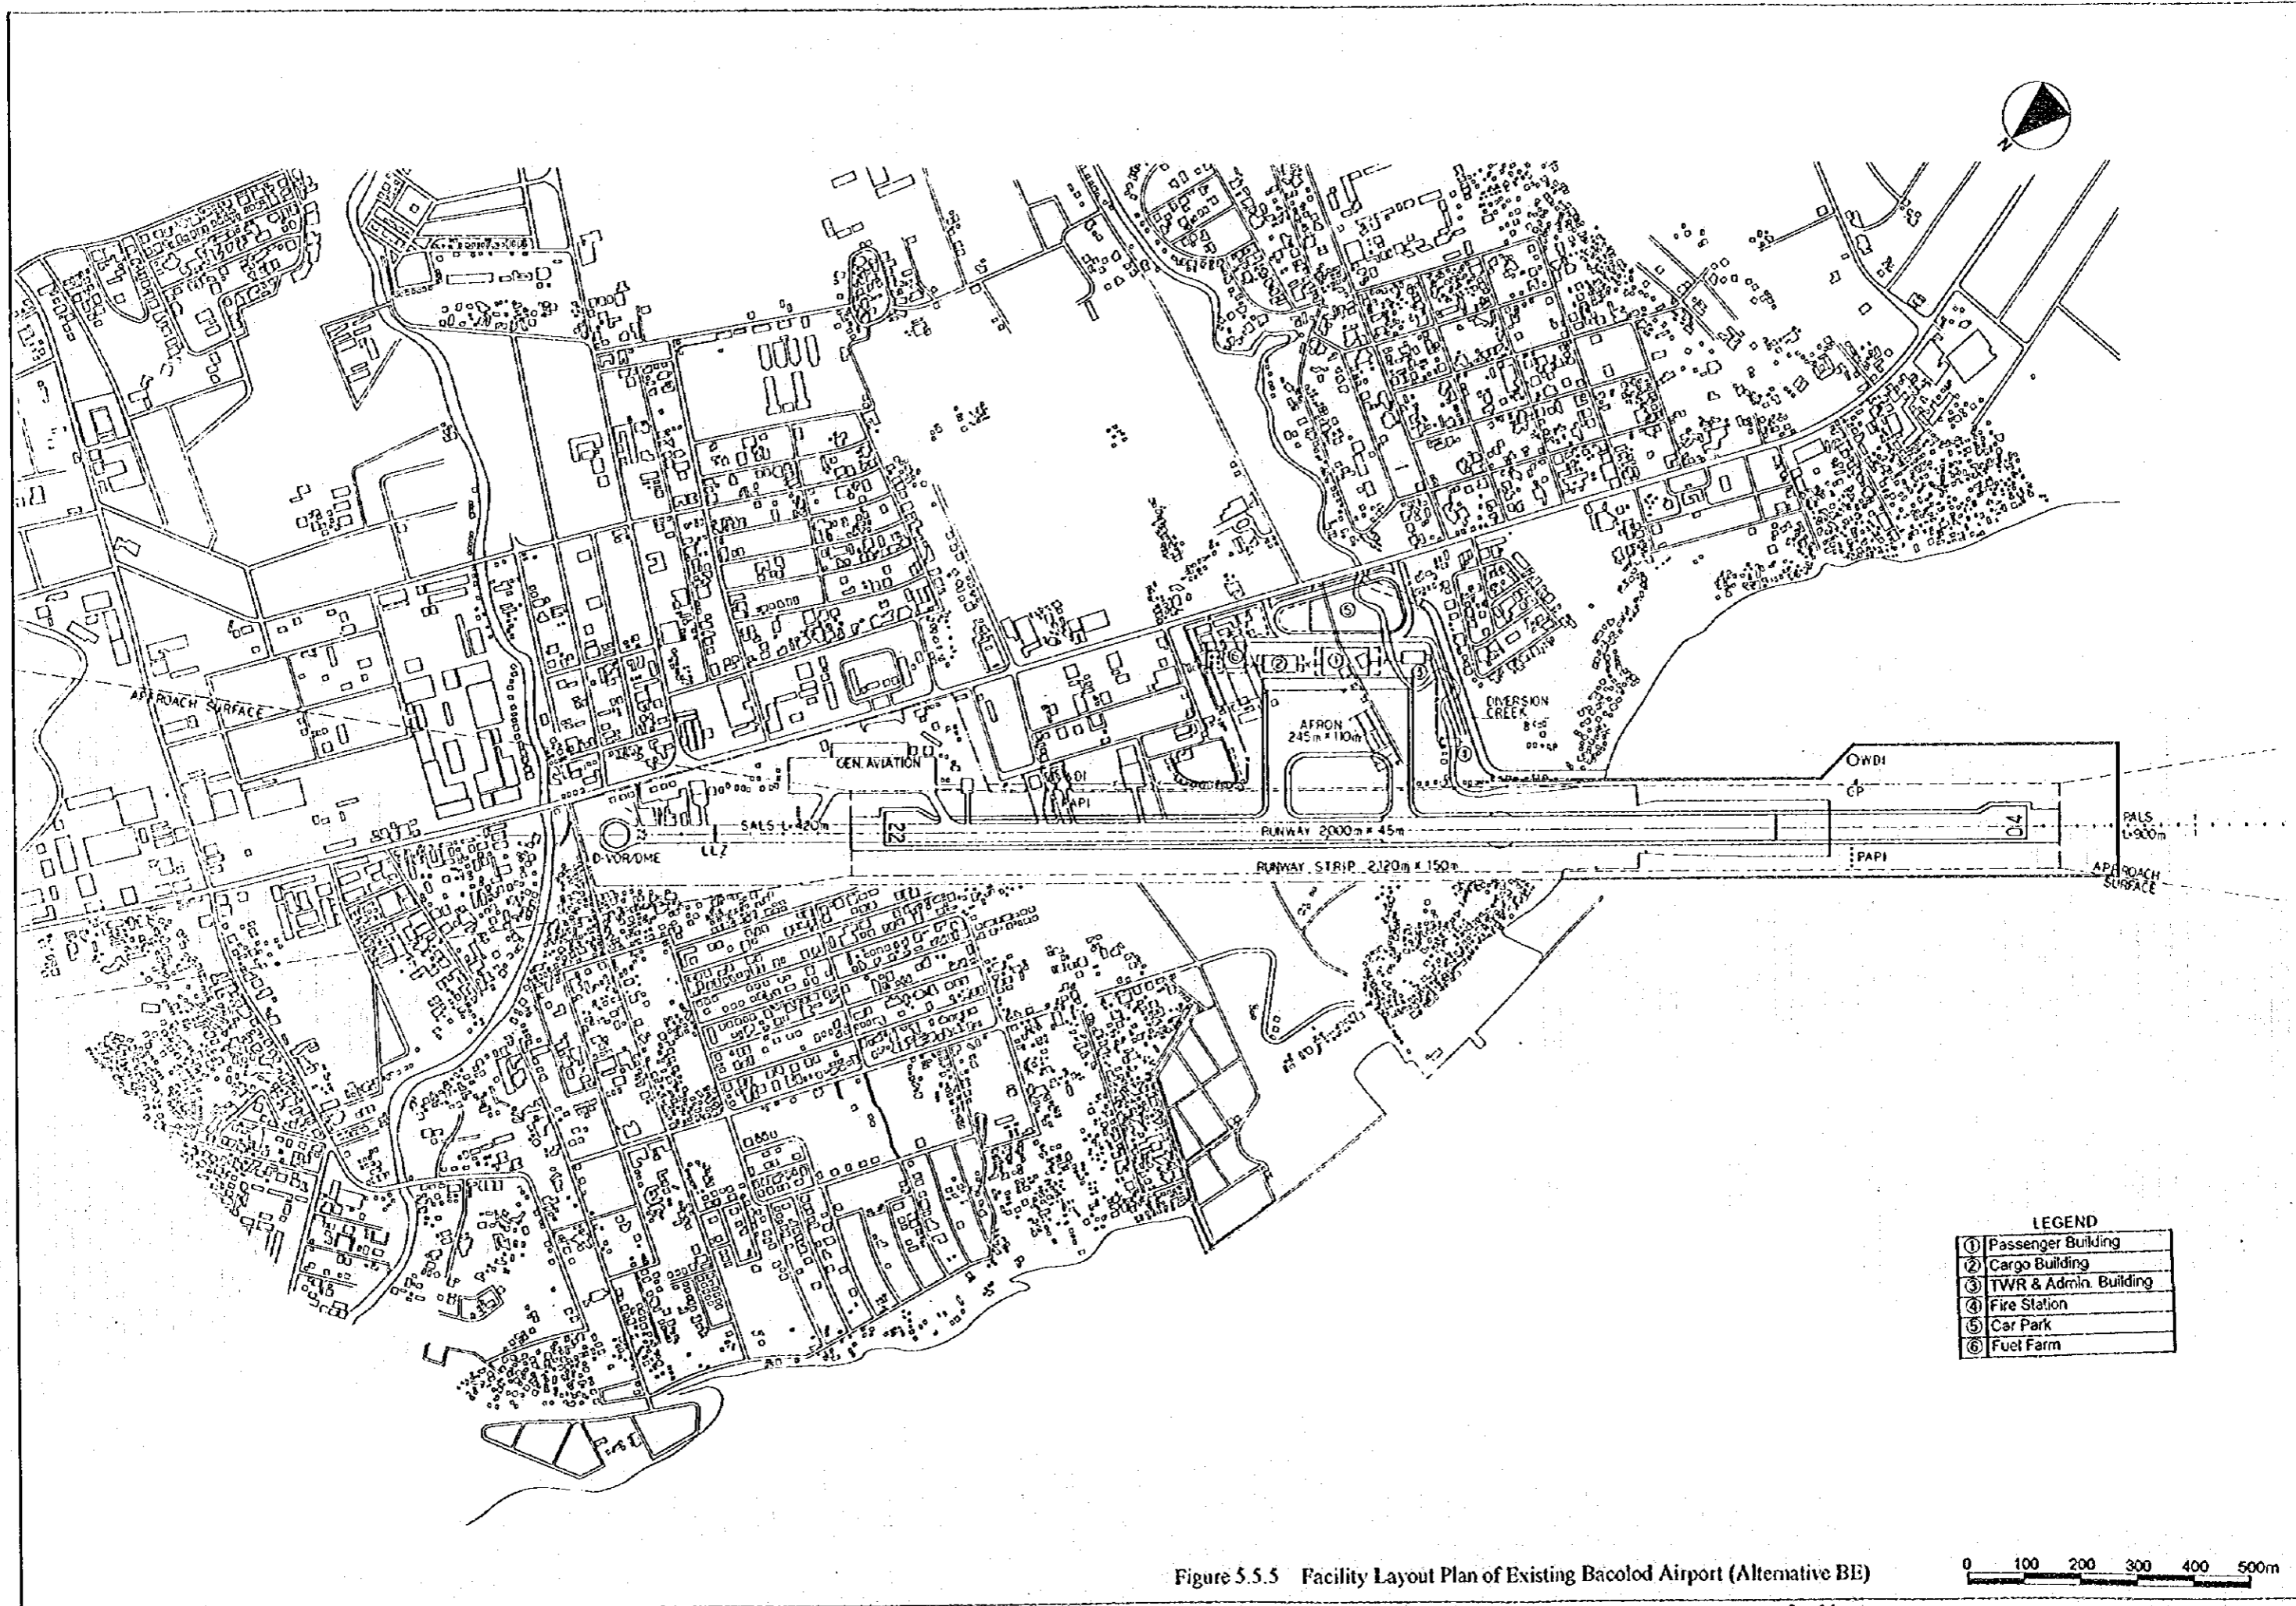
Facility Layout Plan of Existing Bacolod Airport (Alternative BE)
